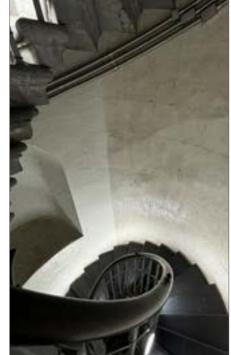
3 wall finishes: repainted walls at bottom of stairwell; upper stair is cleaned to head-height, then dirty above, 2024
